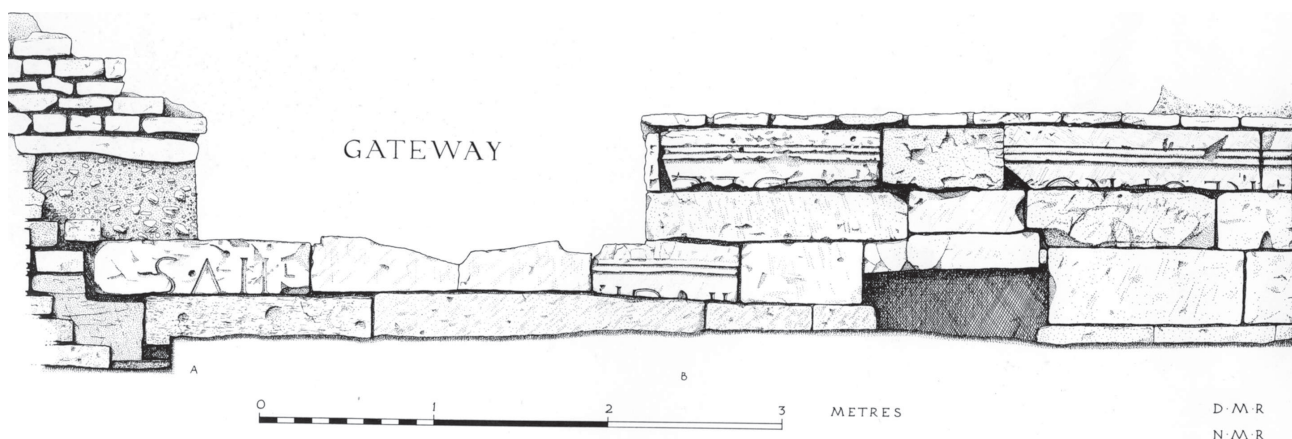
South elevation of the lower outer walls of the gateway and rebuilt wall to its east, showing inscribed stones (D M and N M Reynolds; cf Figs 7.42–43): Trench D, LUB 7.
